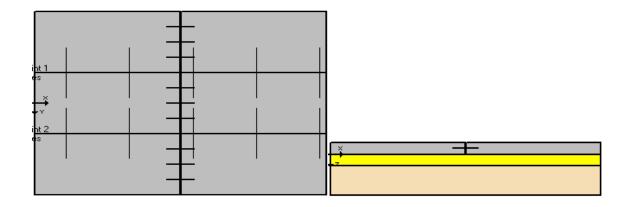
Typical 3 layer pavement configuration for multiple slab modeling without asphalt layer
